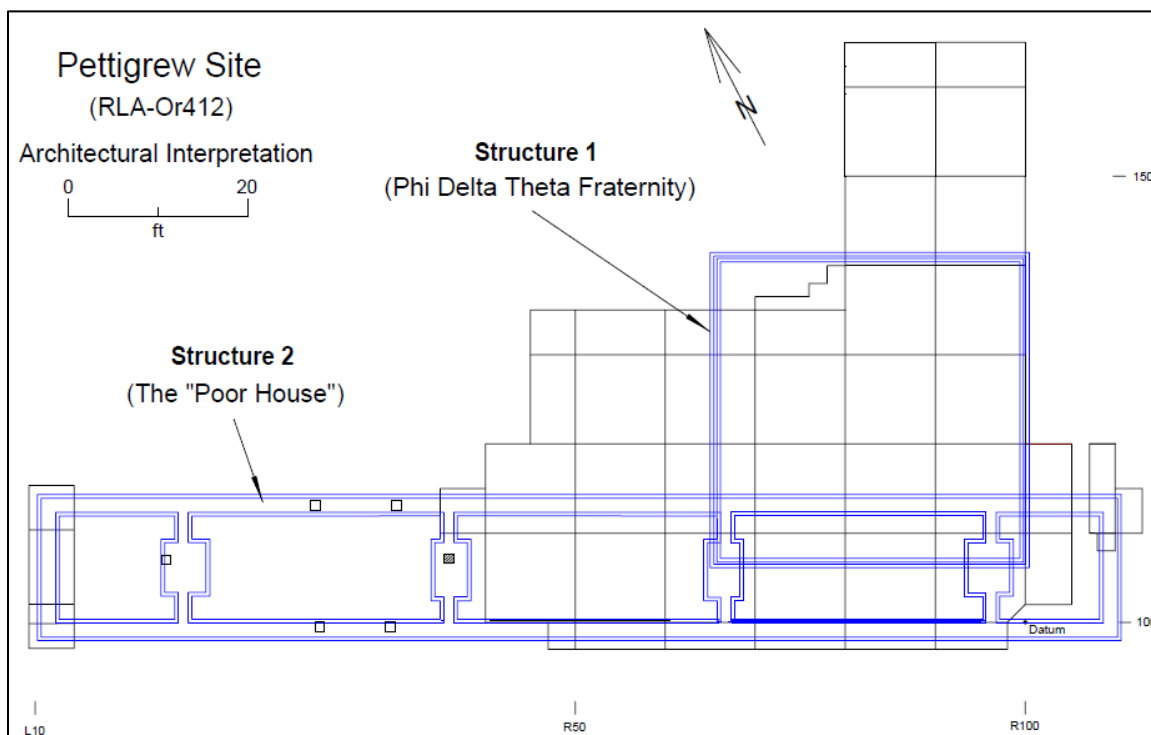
Architectural interpretation of the foundations identified at the Pettigrew site (Jones et al. 1998).
